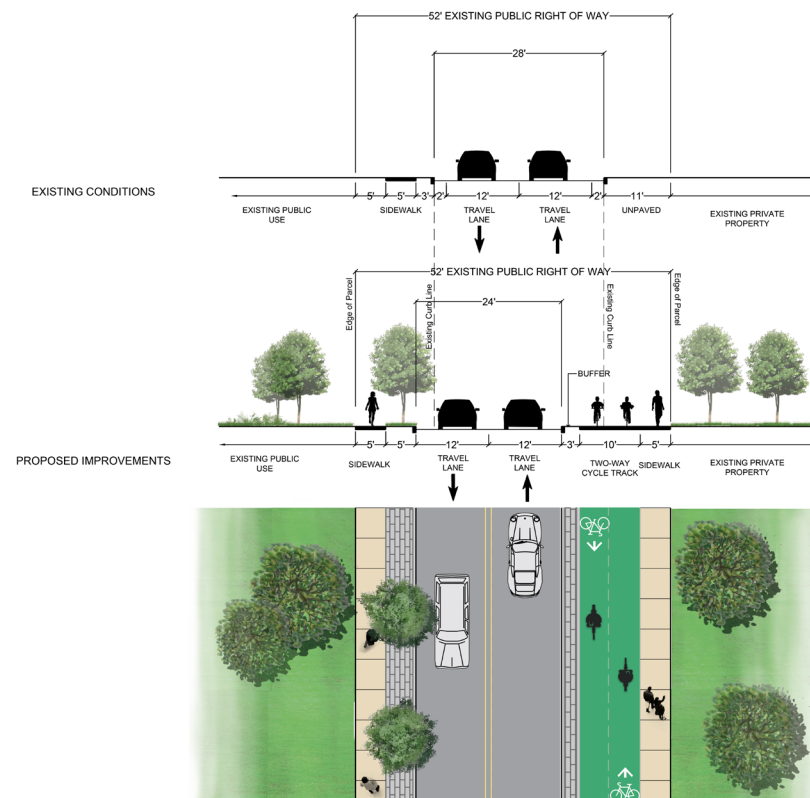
PROPOSED BRIDGE STREET CROSS-SECTION SECTION A1: LOOKING EAST (AS IDENTIFIED IN FIGURE 22)
